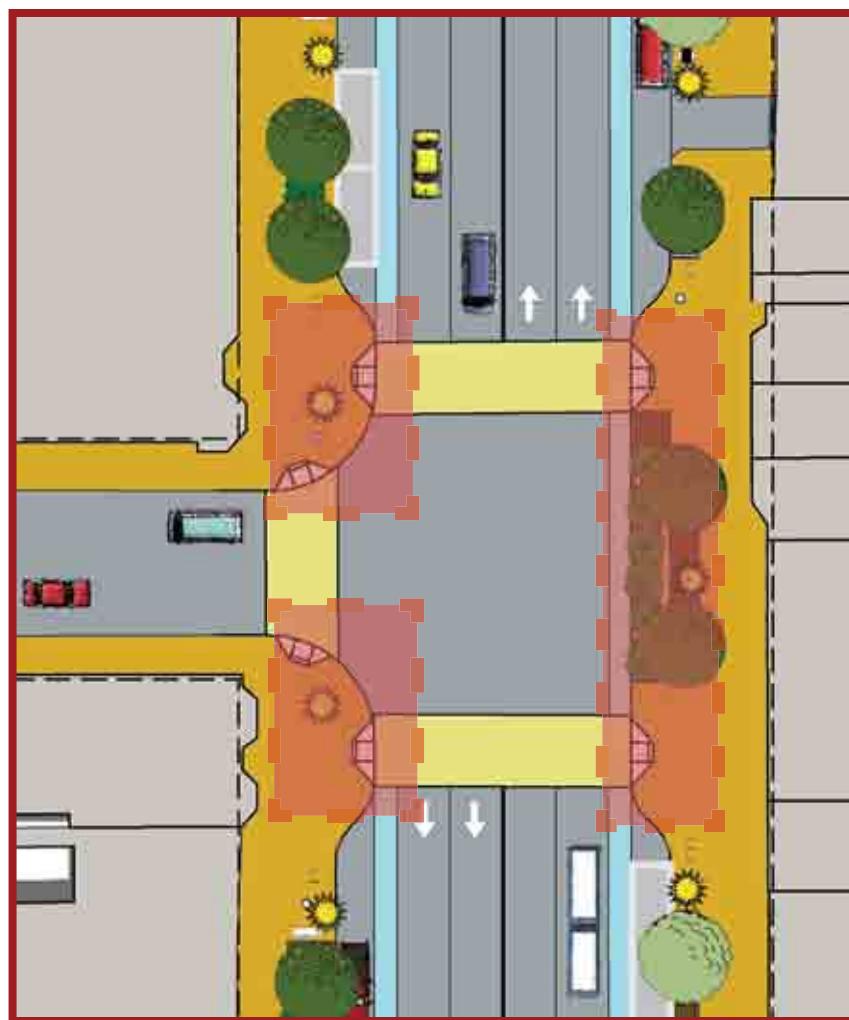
Example of Bulb-outs at a 14th Street NW T-intersection
